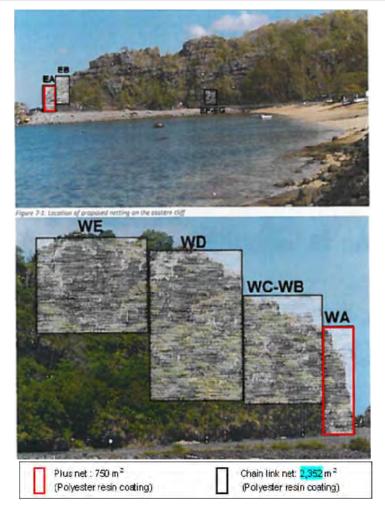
Scope of measurement and construction method in Maconde rockfall (Source: JET)
